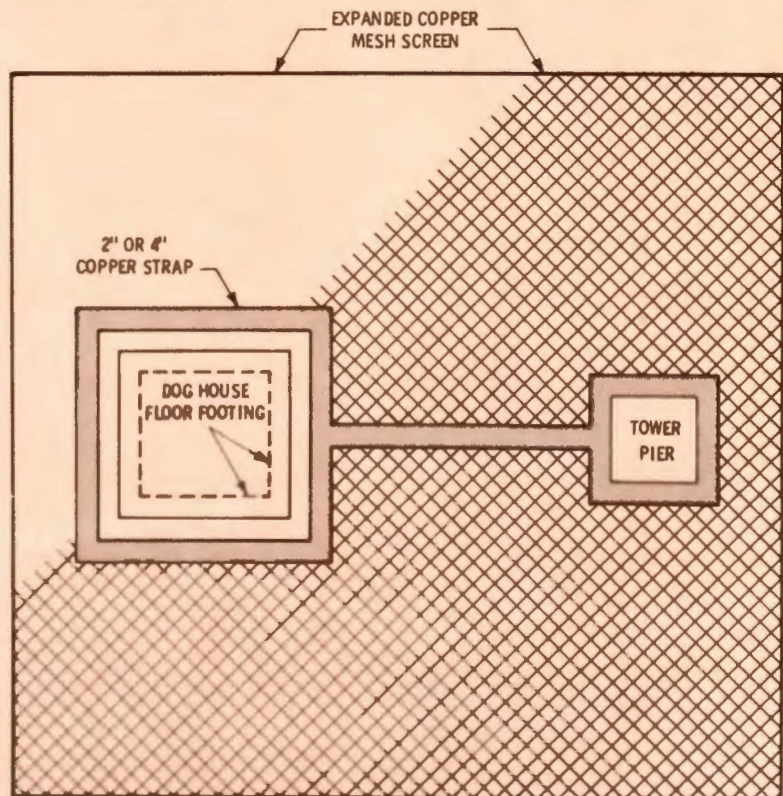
Top view of tuning house, pier and surrounding copper screen.
